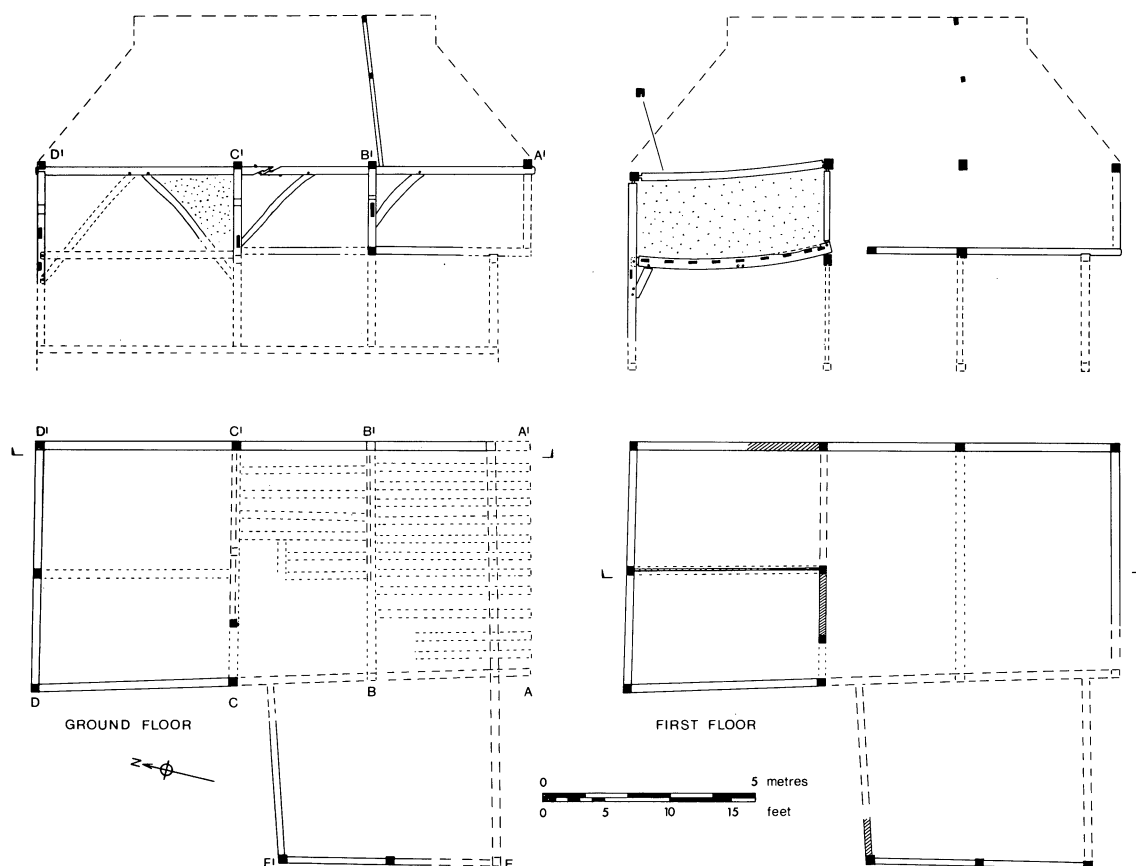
Cradlers, Leatherhead: plans and long sections of original fabric. The left-hand section is an internal elevation of the east wall: that on the right corresponds with the section-line on the first-floor plan
